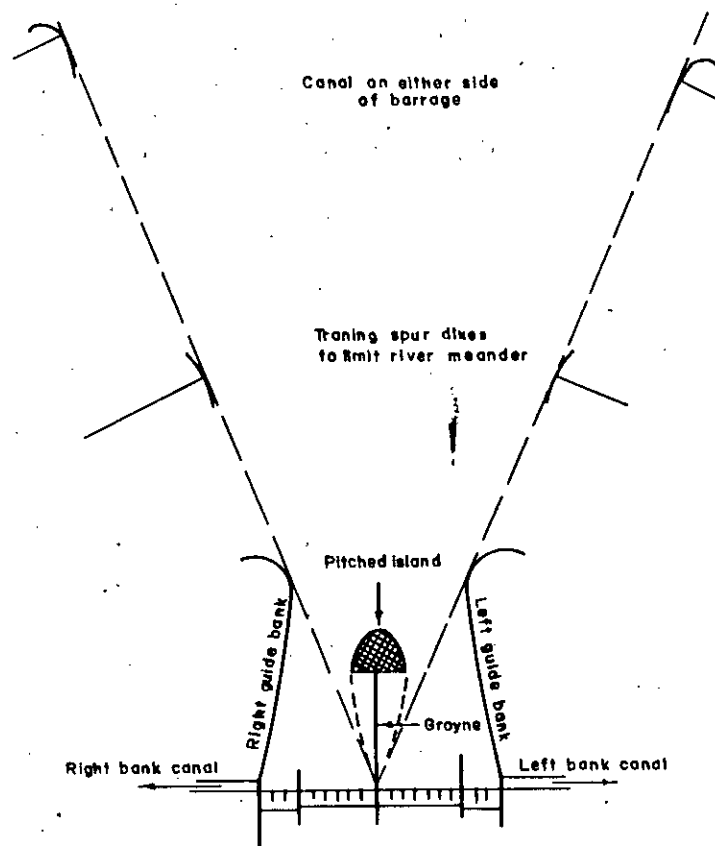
LAYOUT OF KOTRI DIVERSION DAM (PAKISTAN) AS CONSTRUCTED
